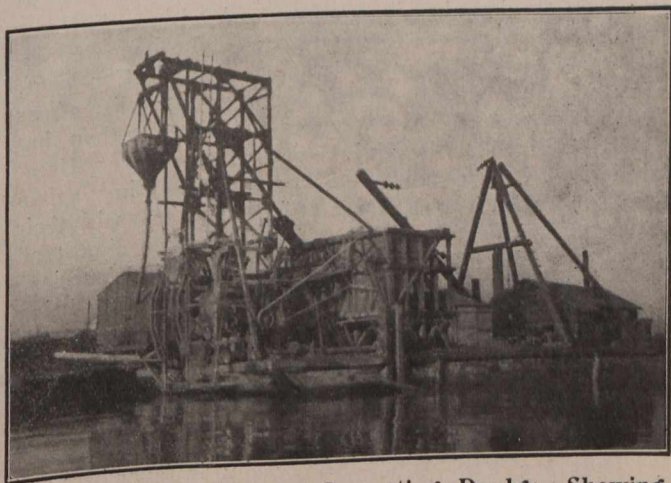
Front View of Concreting Dredge, Showing Elevating Apparatus, Etc.
